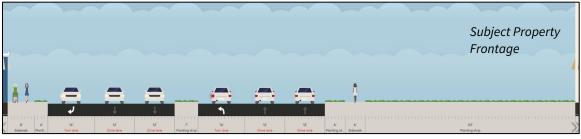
Existing 170 ft. Cross Section for Century Boulevard Looking North
